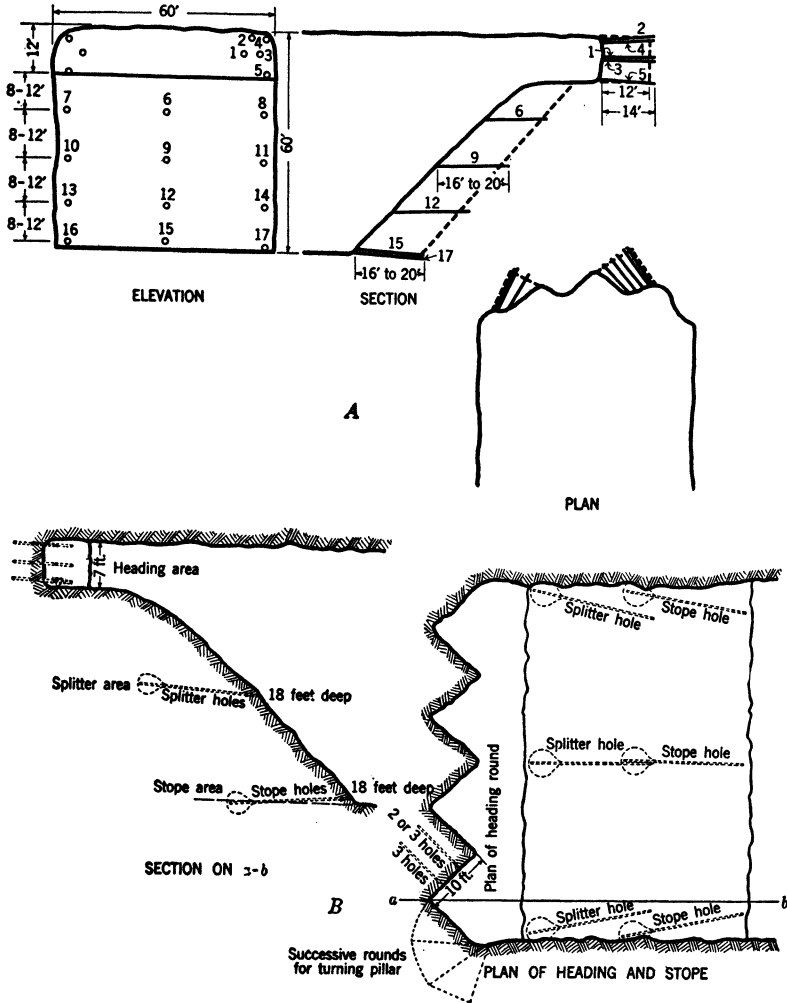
Heading and bench stoping, Tri-State district; B, heading and bench stoping, showing use of "sprung" holes.
